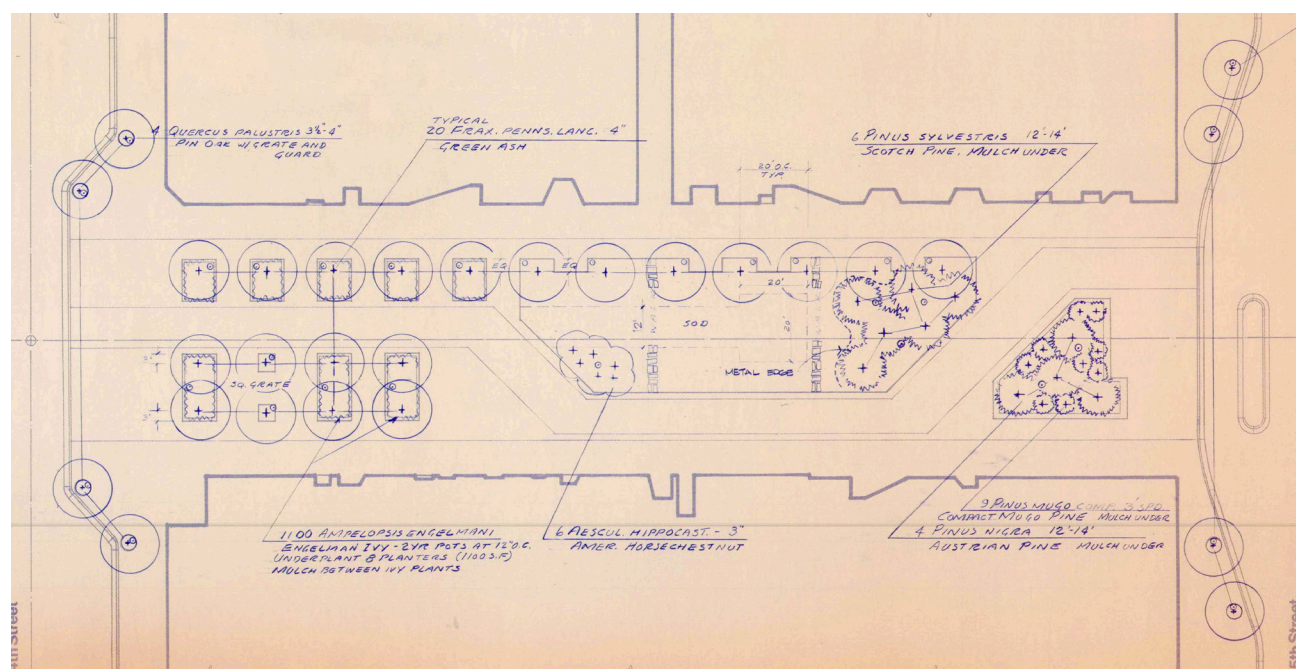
Planting plan of 1100 Block of Pearl Street Mall, 1976 (source: City of Boulder)
